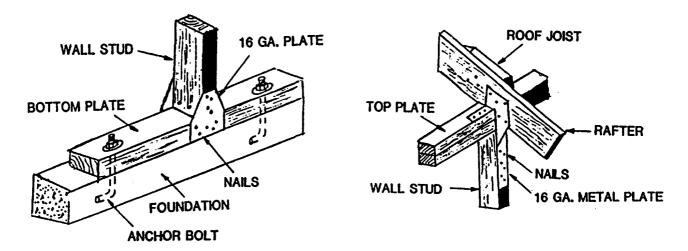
Wall-floor connection detail in wood framed construction needed to resist lateral loads.
